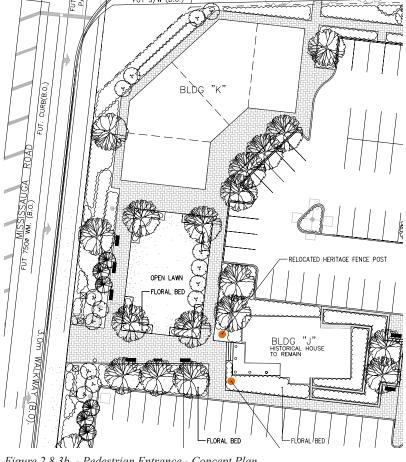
Pedestrian Entrance - Concept Plan
